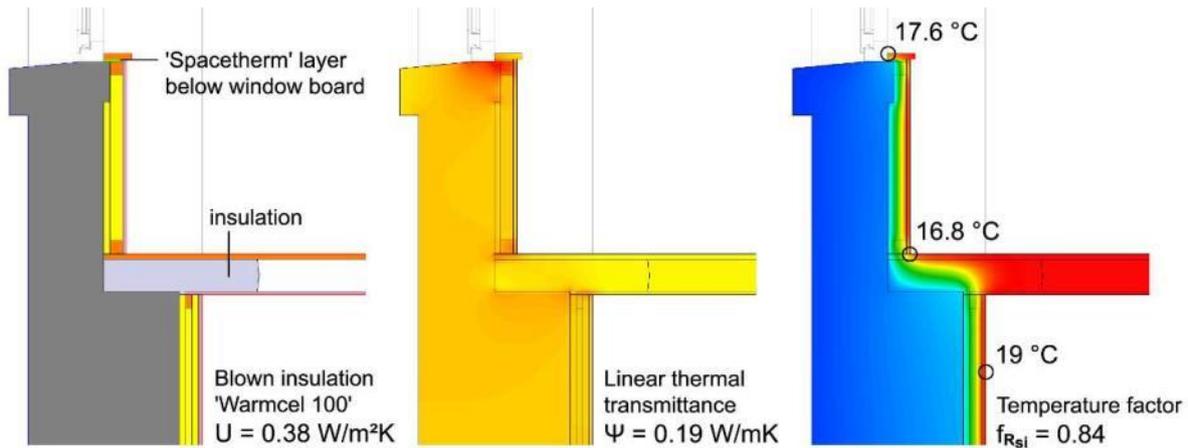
Cross section of a wall with a window breast, which, in comparison to Figure 93, has received additional insulation at the cill-window and floor-wall junctions: in this advanced retrofit scenario, thermal bridging has reduced significantly, surface temperatures have increased, and the temperature factor is now above the 0.75 threshold.
